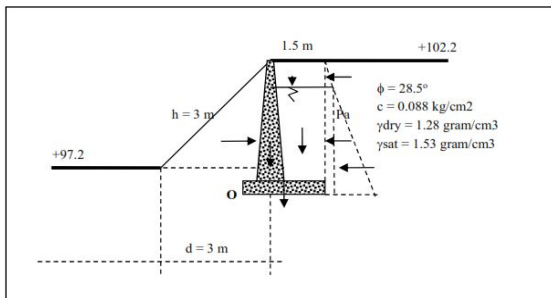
Ground Retaining Wall Structure E. 2-4 m
